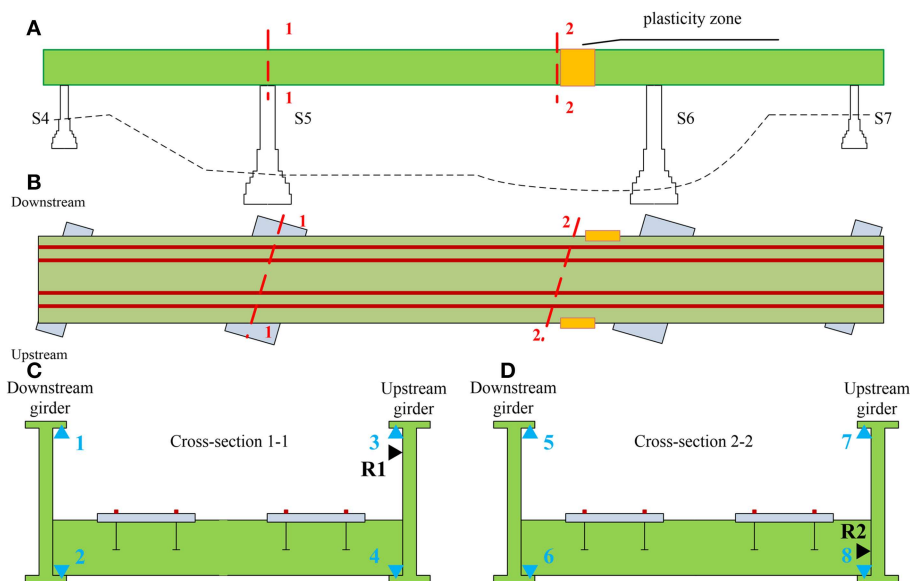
| Strain measuring points: (A) longitudinal section of the bridge over the river; (B) plan view of the bridge; (C) cross-section 1-1; (D) cross-section 2-2.
